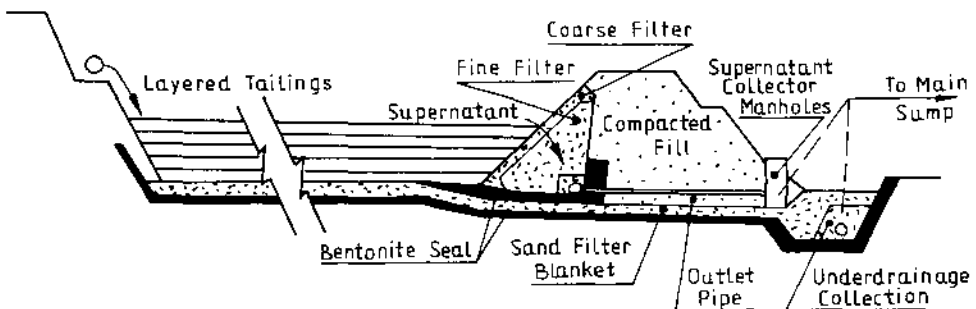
Subaerial placement of tailings (Robertson et al. 1978).
